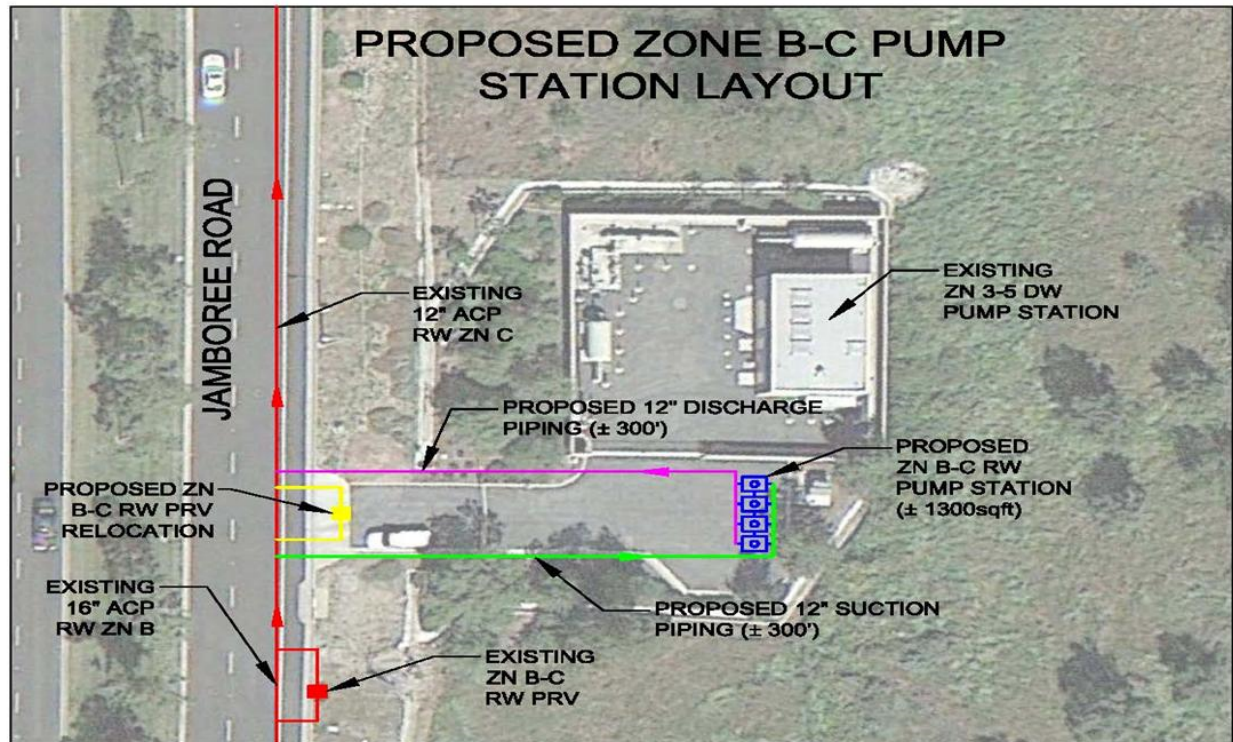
ILP Conversion Project Zone B-C Pump Station Site Layout
